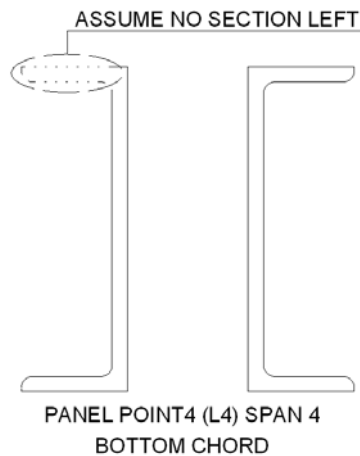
Truss Bottom Chord – Section Loss in Top Flange
